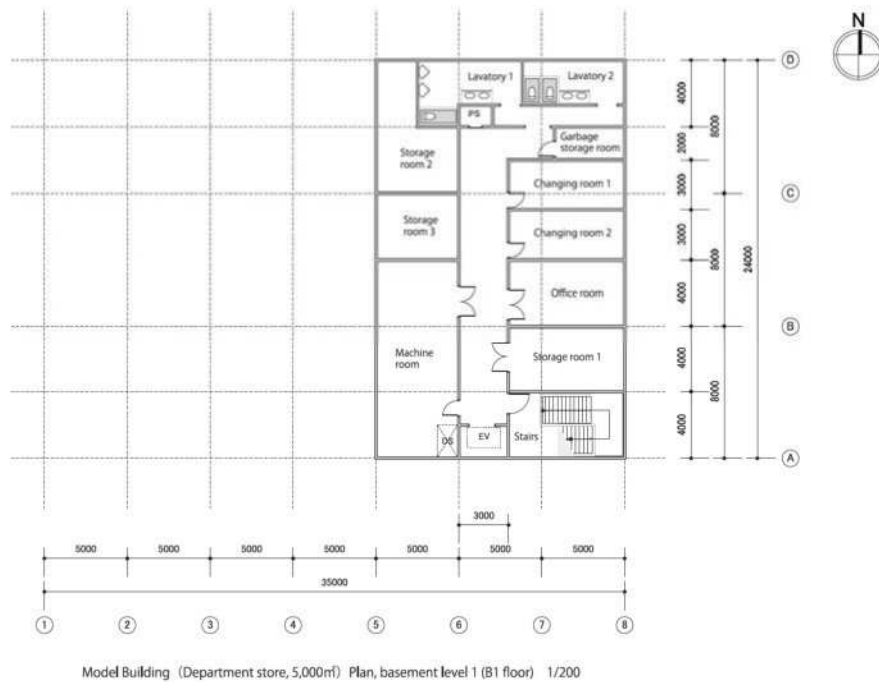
Model building (department store, 5 000 m²) plan, basement level 1 (B1 floor) 1/200
